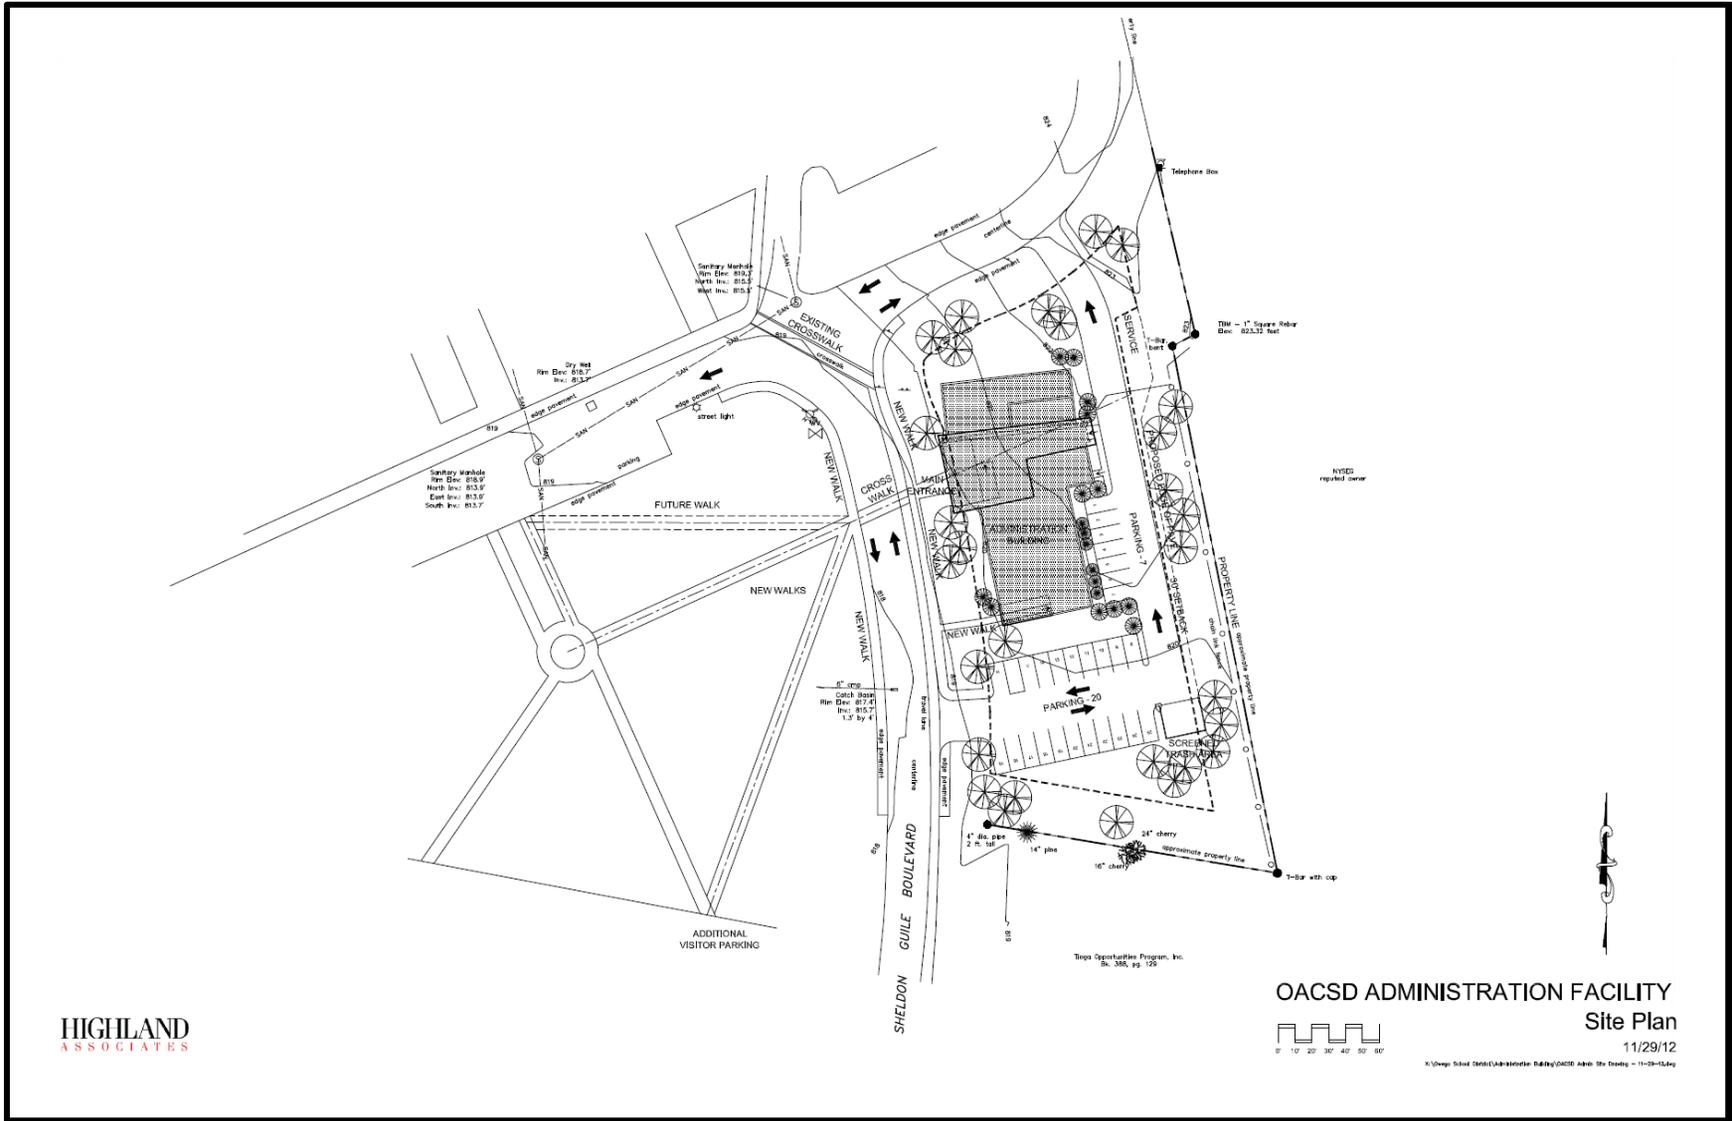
Proposed site plan for New Administration Building Facilities. Source: Environmental Assessment.
